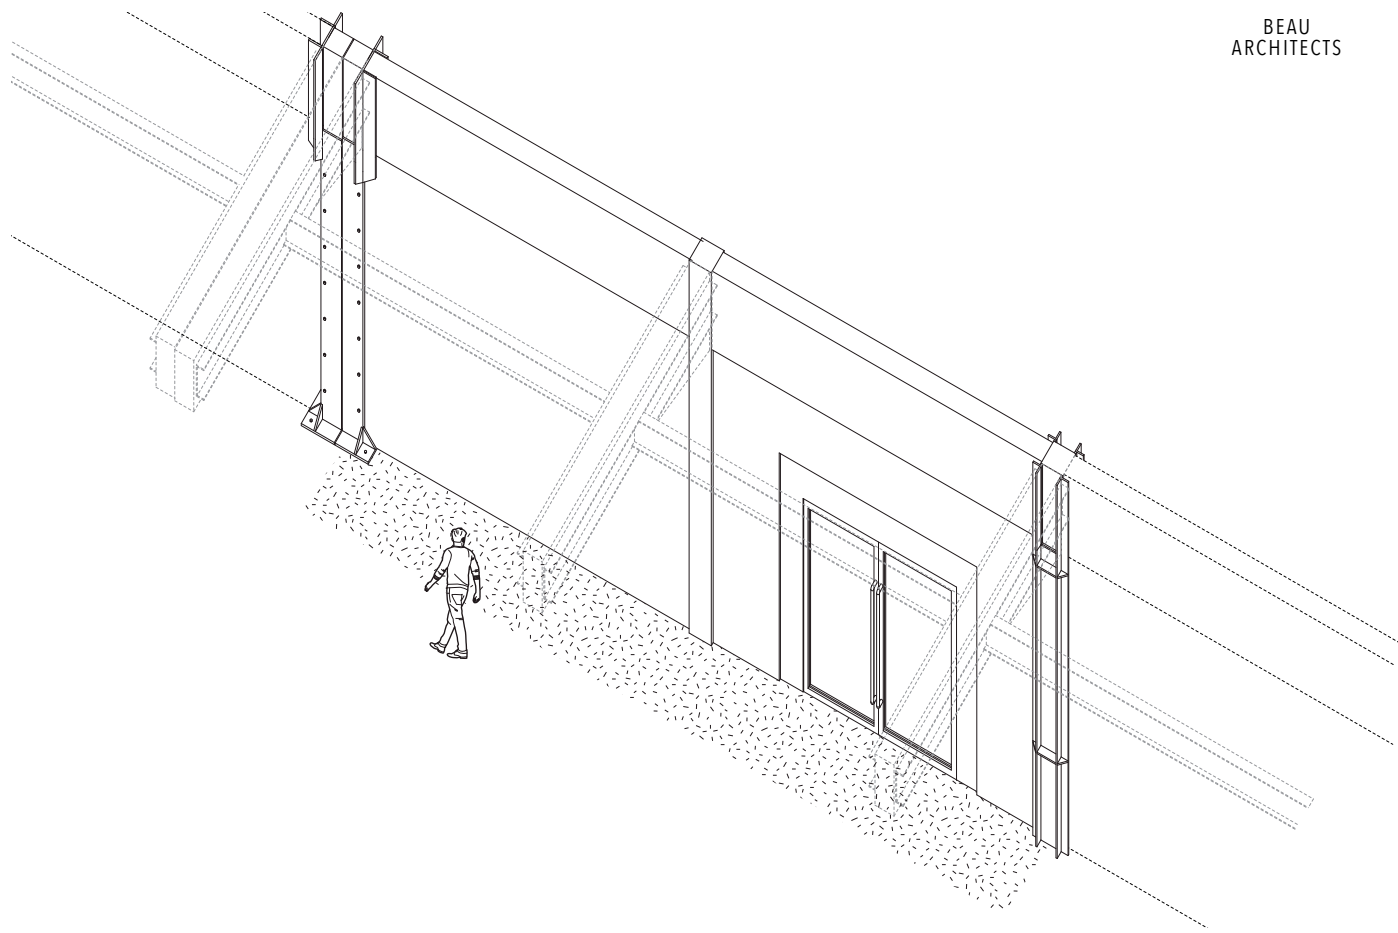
PLACING WALLS INBETWEEN COLUMNS
